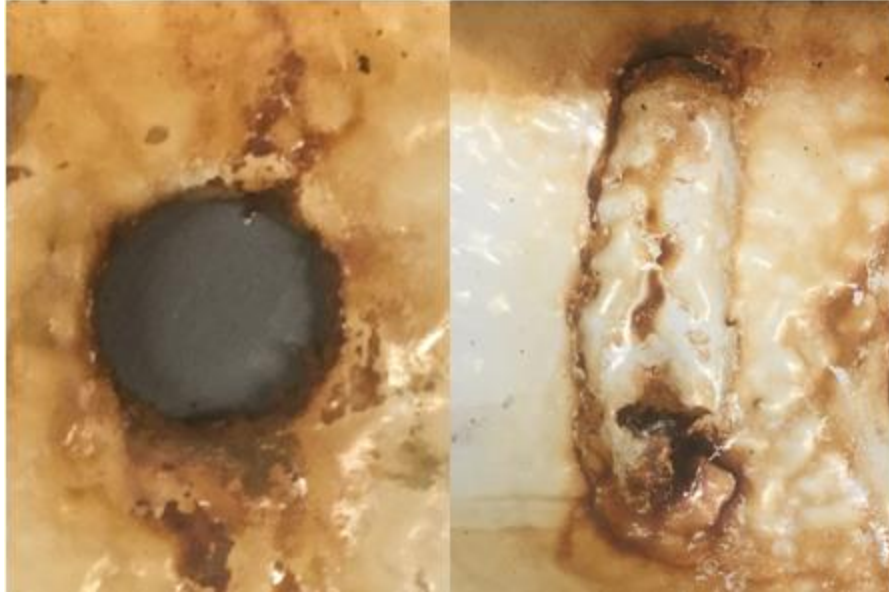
Typical Corrosion Pitting at Simulated Bolt Hole & Weld
